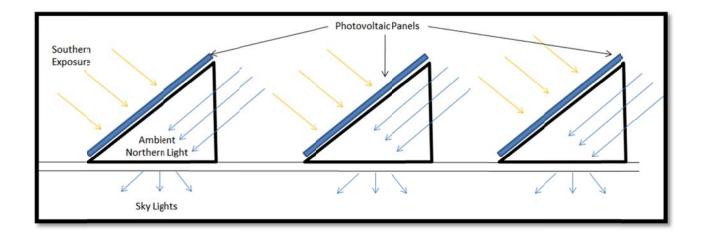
Section View of Proposed Photovoltaic Panels Mounted to Sky Lights
